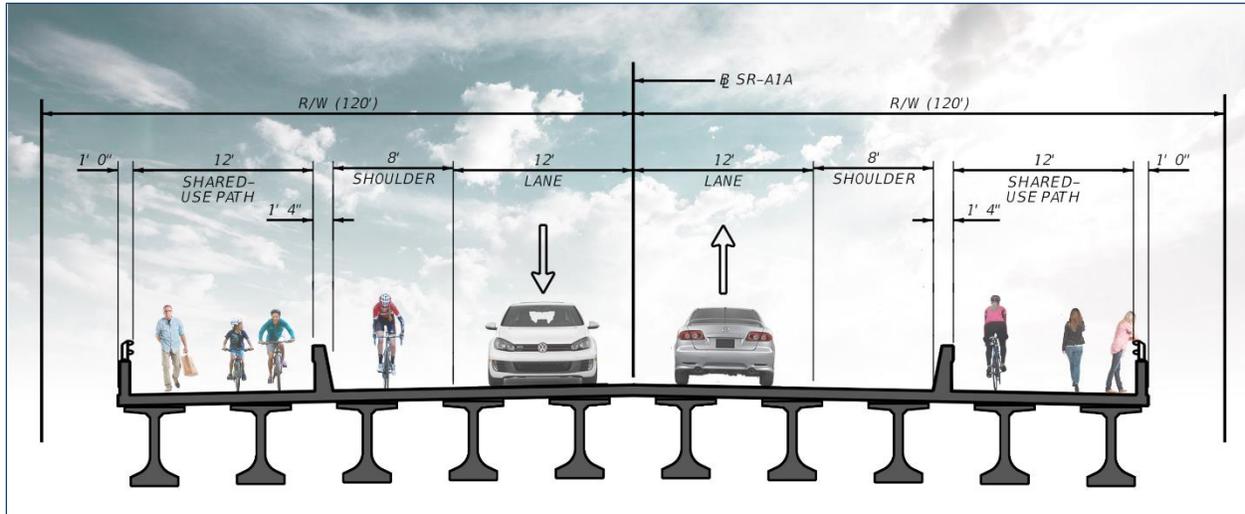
PREFERRED ALTERNATIVE BRIDGE TYPICAL SECTION
